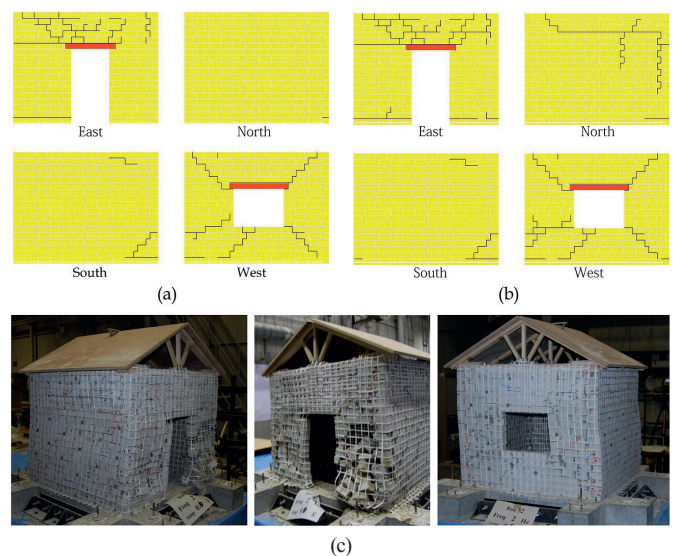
House model 3 at various levels (a) crack pattern at run 34 (b) crack pattern at run 40 and (c) damage level at the end of run 52
